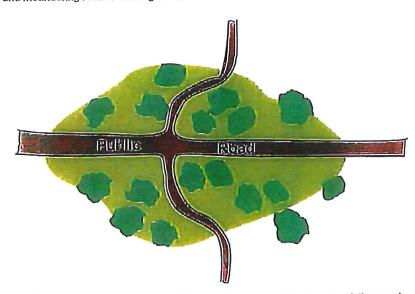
Correct positioning and "dogleg" layout of a new track leaving an existing roadway
